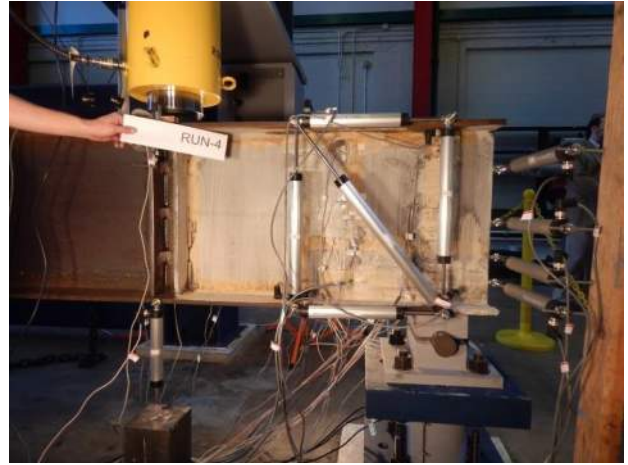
Damaged Girder Left: 32 kip
